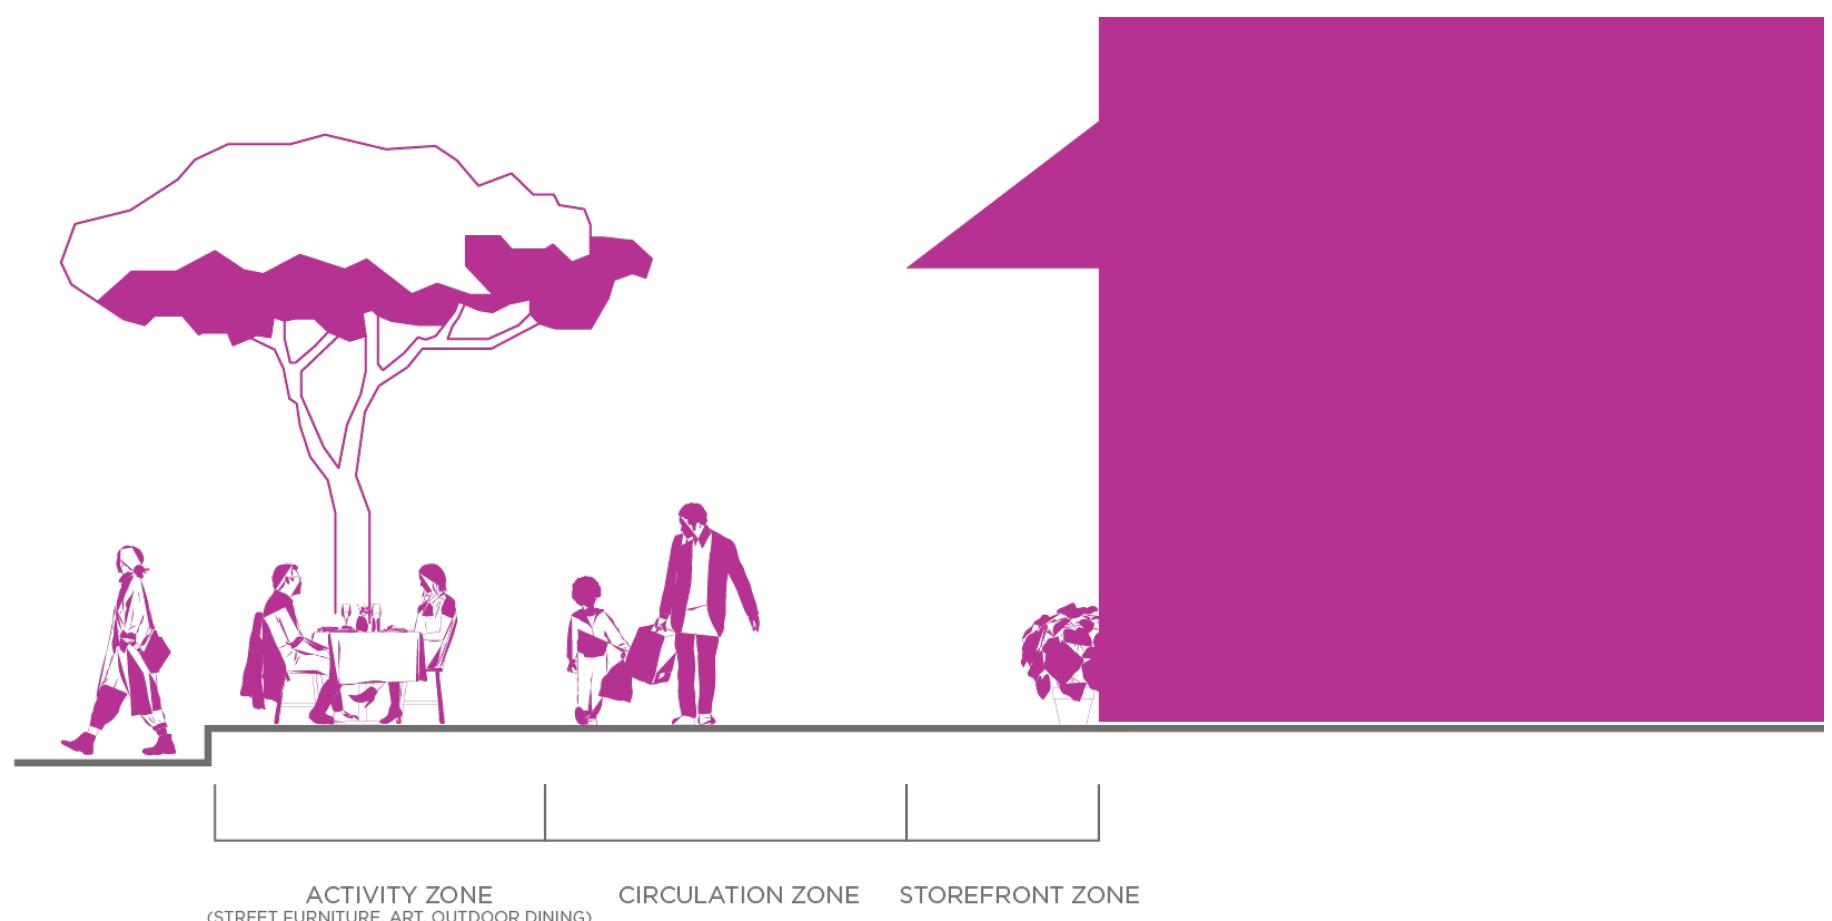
BUILDING TO SIDEWALK RELATIONSHIP INTERNAL TO A MIXED-USE VILLAGE AREA
